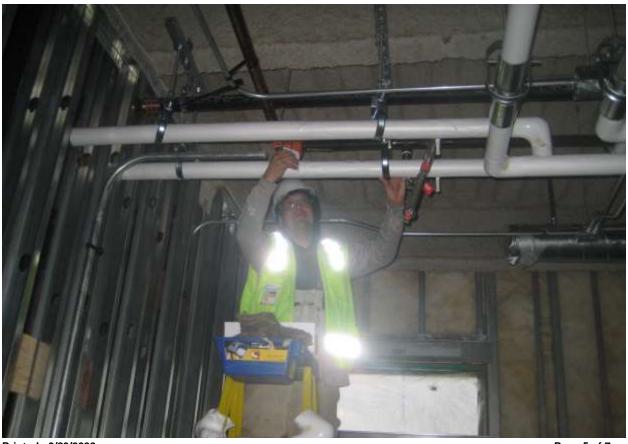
AIS worker, Tom, installs rigid glass pipe insulation to copper supply lines on the third floor in room 315, *Break Room*.
